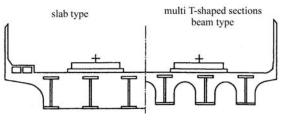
Concrete encased steel continuous girder with T-shaped cross sections
